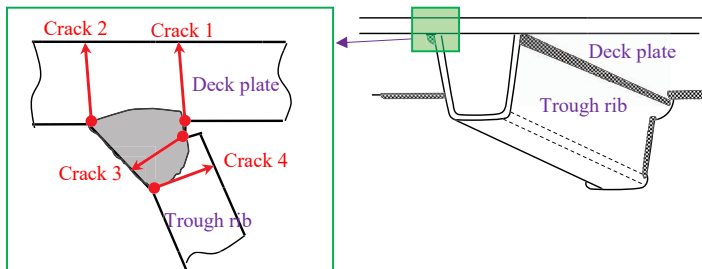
Typical fatigue cracks at rib-to-plate welded joints. Source(s): Authors' own work
